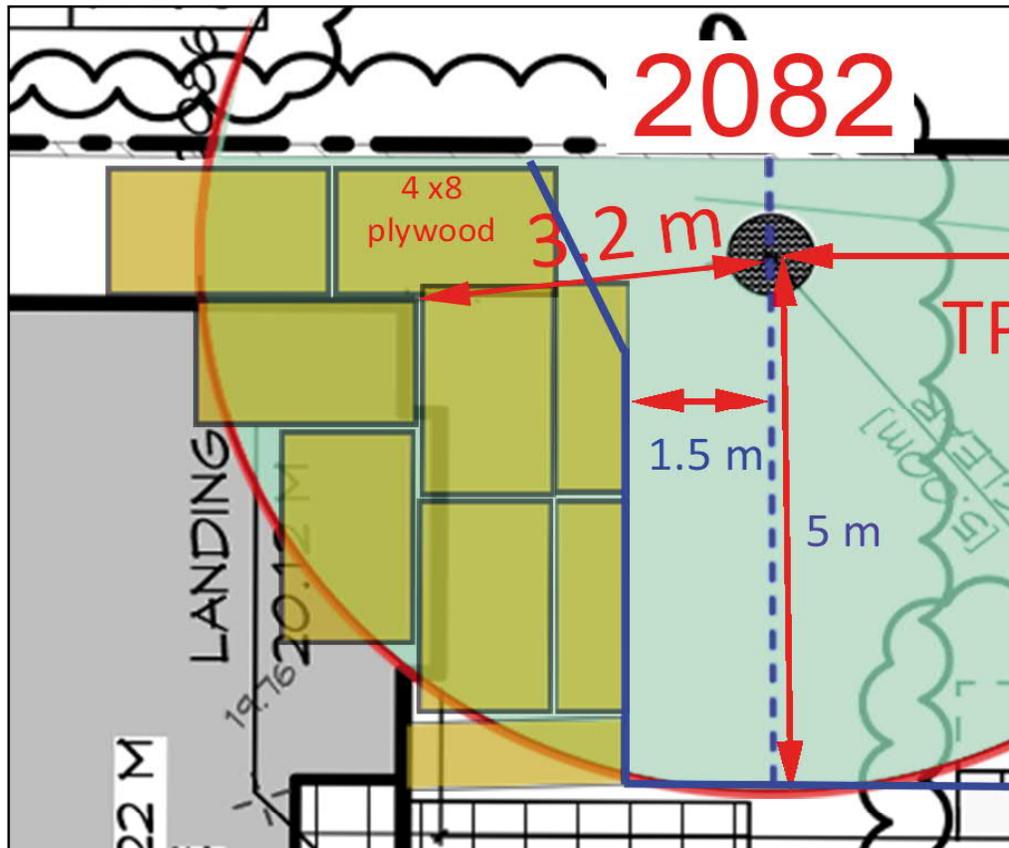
Conceptual layout of plywood beyond fence, and under grade beam and slab.
